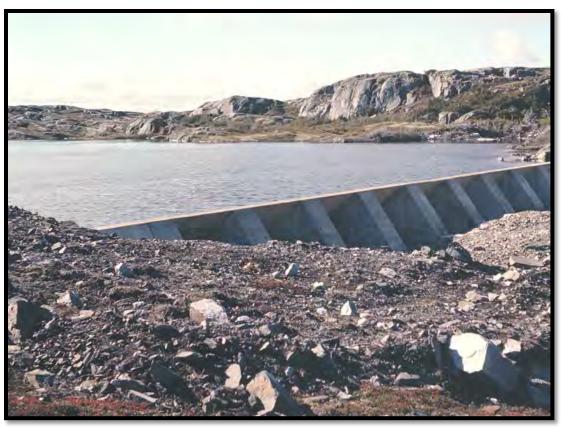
View looking north, towards the pumphouse Site dam for the water supply - July 1959.
